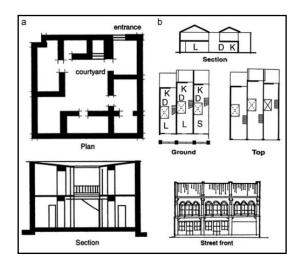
1: section and plan of house of Ur, Mesopotamia (Rasdi, Tajuddin, & Ahmad, 2000)
